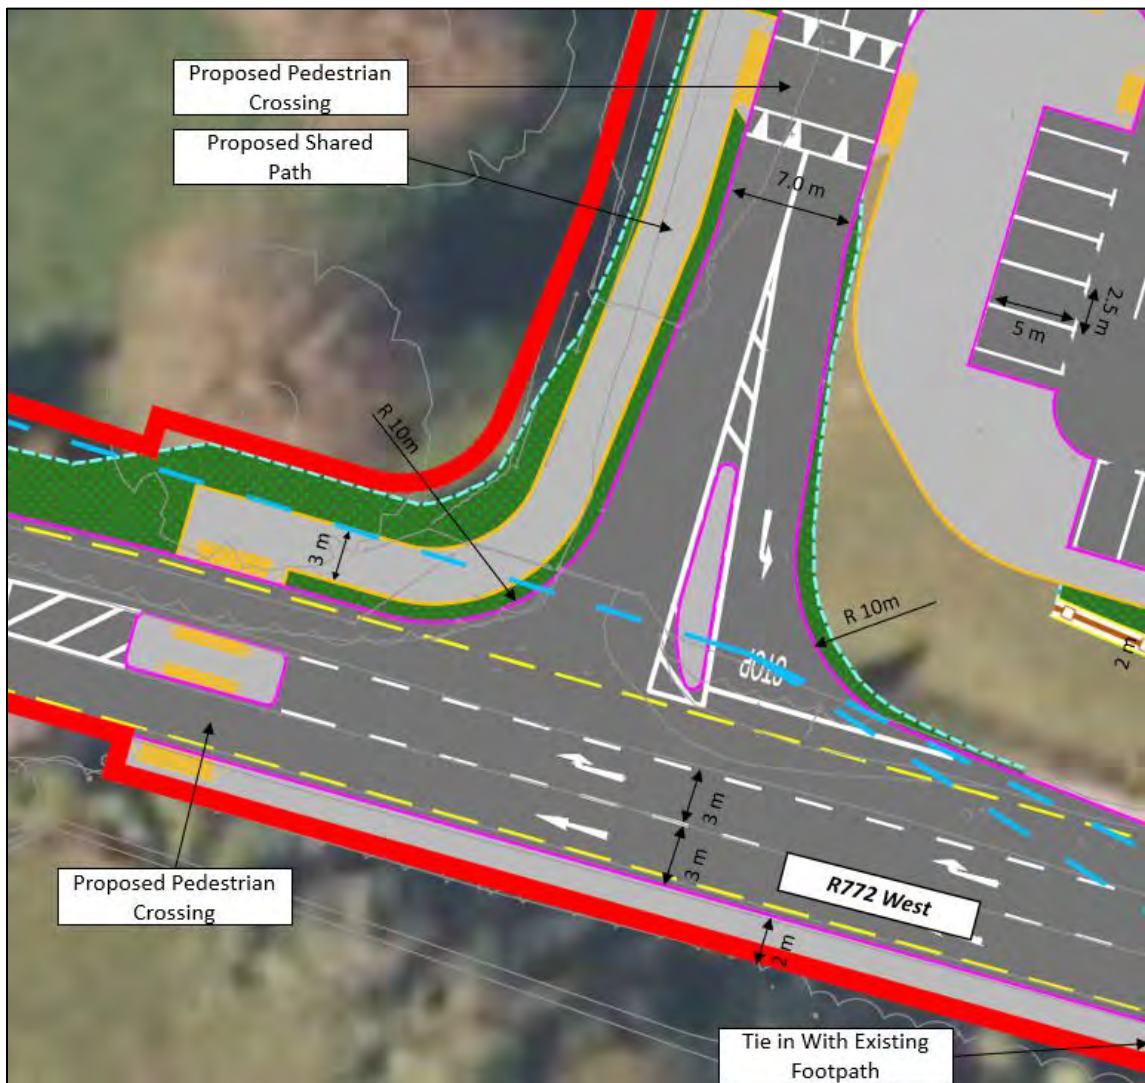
Pedestrian/ Cyclist Access to the Proposed Site
